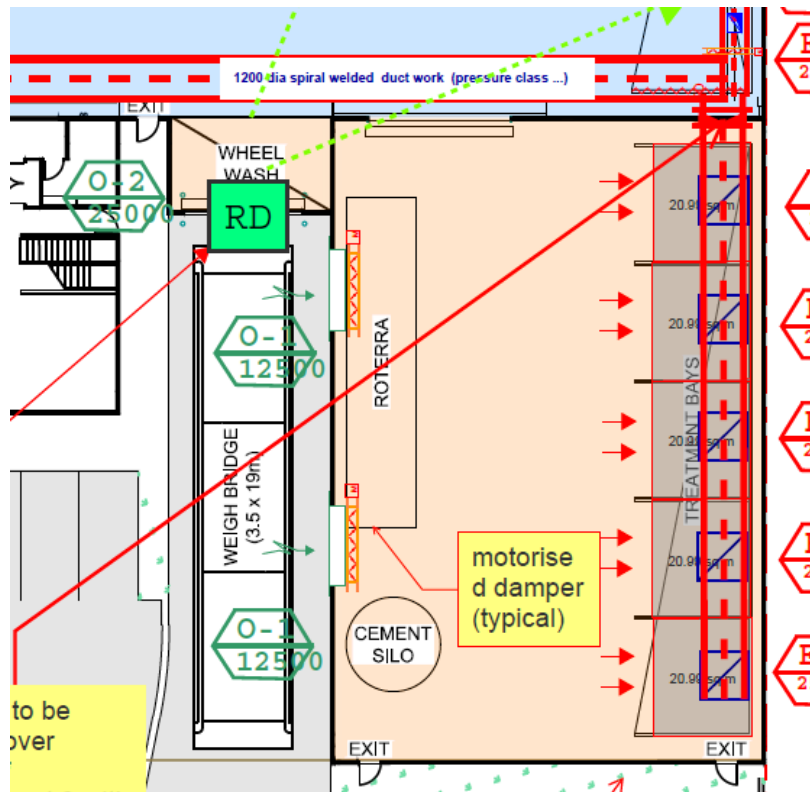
Motorised Dampers to be Located at Least 6 m from Wheel Wash External Wall – Louvres to be Relocated at Least 6 m Away from External Wall of Wheel Wash
